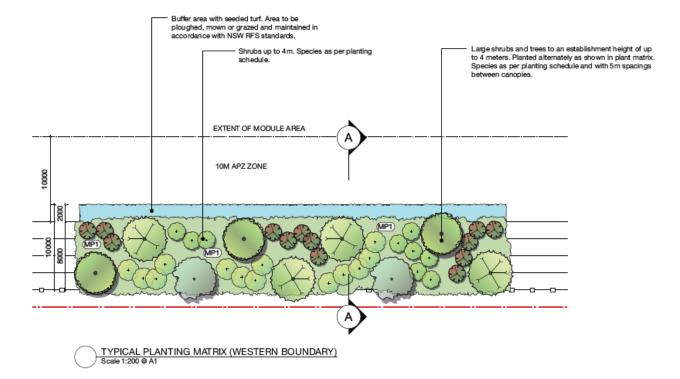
Typical planting matrix, as per the Landscape Plan (Moir, 2025)
